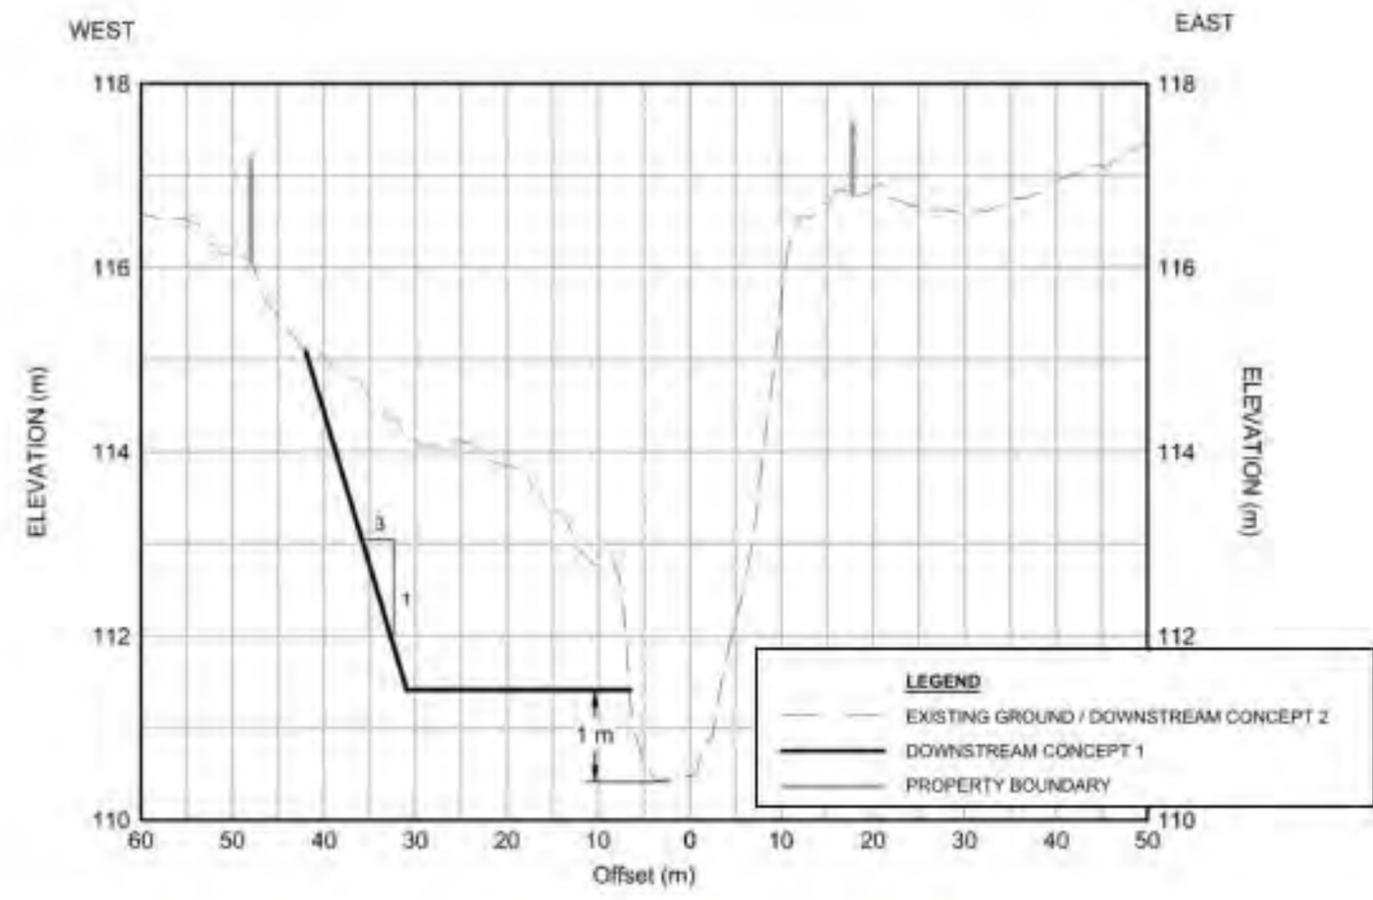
Cross-Section - Downstream Concept 1 and Downstream Concept 2
